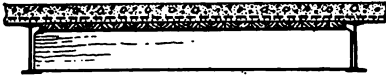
Form for Floor Slab on Top Flanges of Beam.
